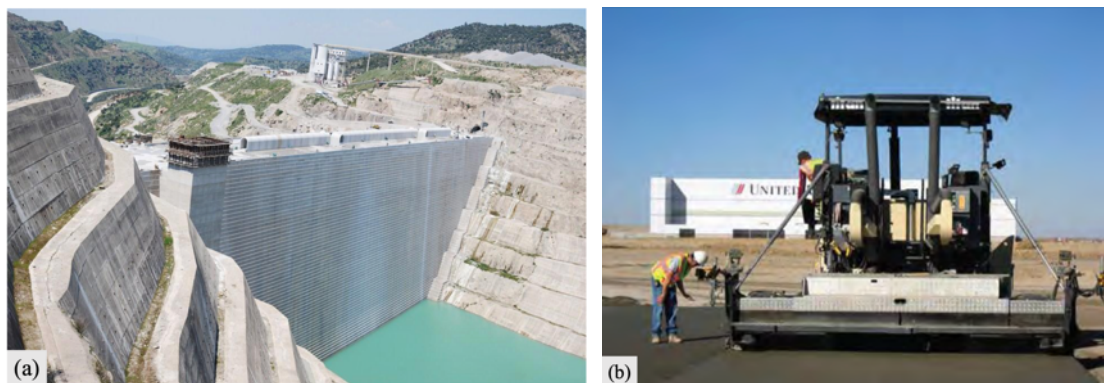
RCC engineering applications of (a) dams [24] and (b) pavements [25].
